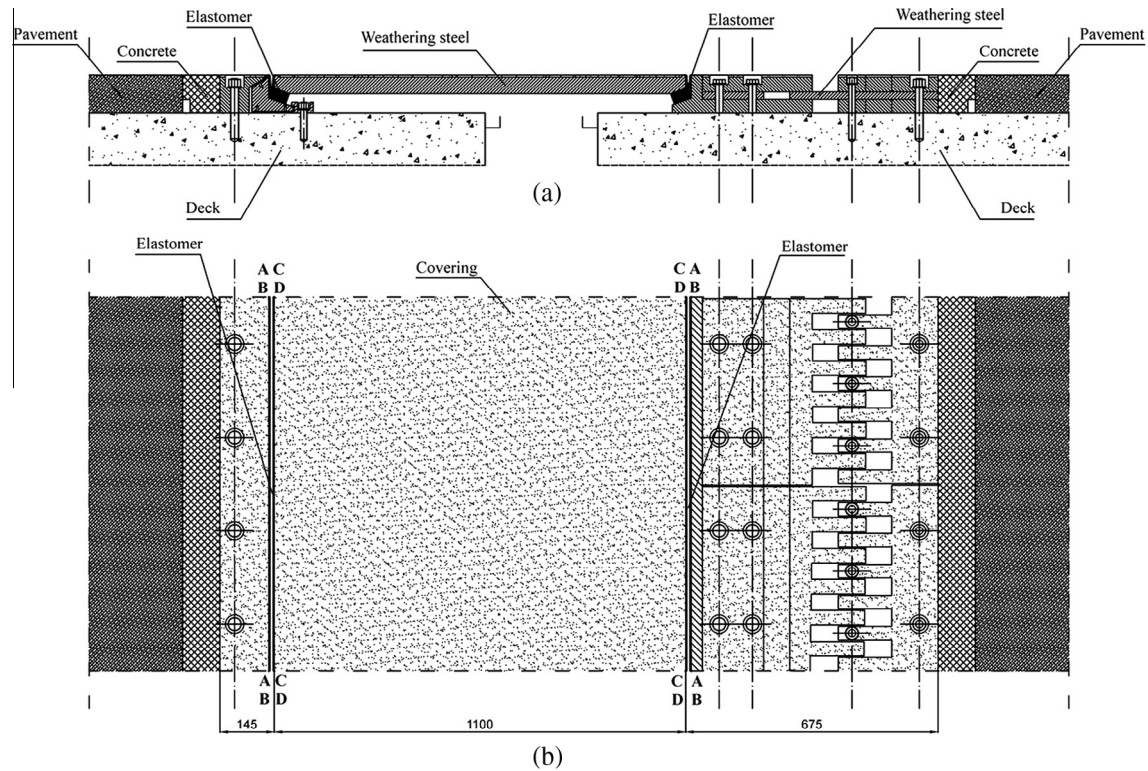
(a) WSEJ's section and (b) planimetric view of a joint portion. Dimensions in mm.
